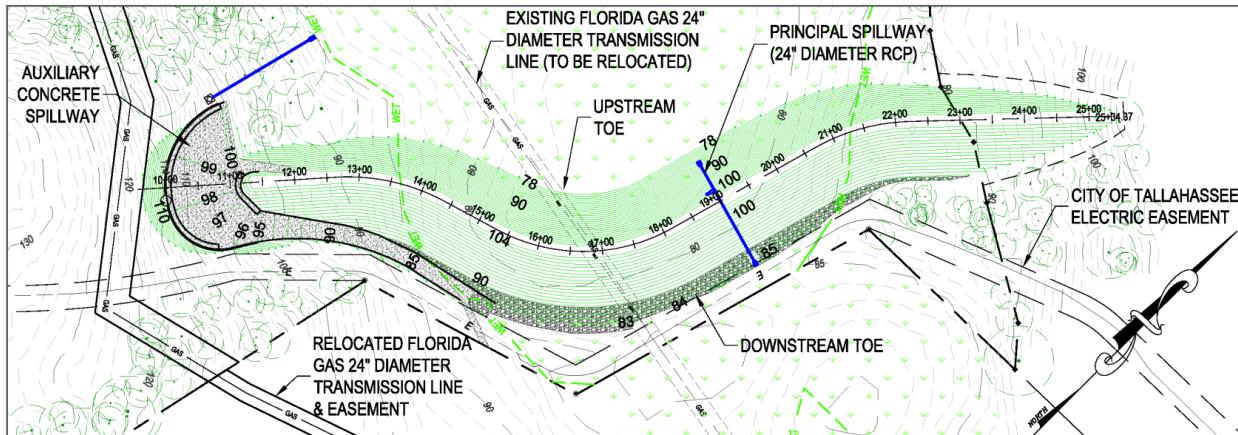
Plan View of the Dove Pond Dam Spillway (Dove Pond Dam Emergency Action Plan 2021)
